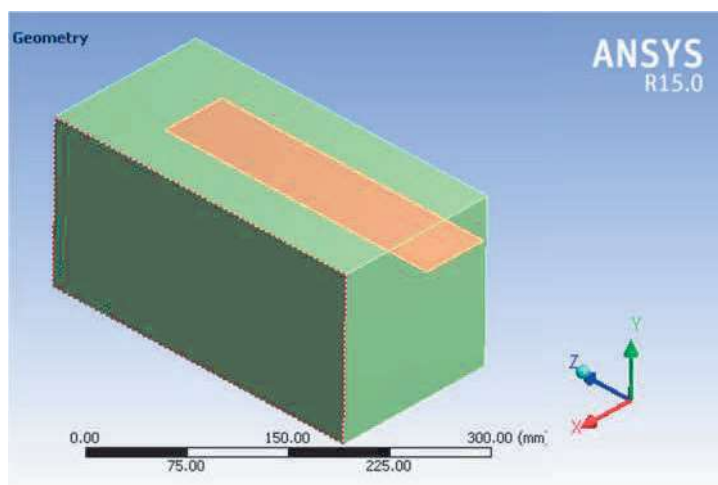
Concrete Specimen with Bonded GFRP (200 mm)
